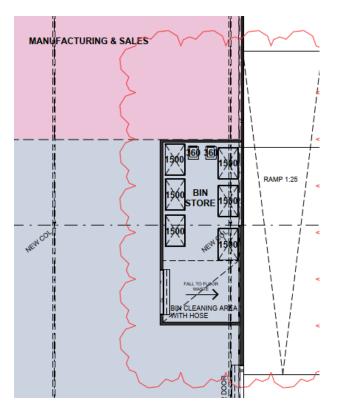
Waste storage, Source: Architectural plan TP400 Rev A by Six Degrees Pty Ltd
